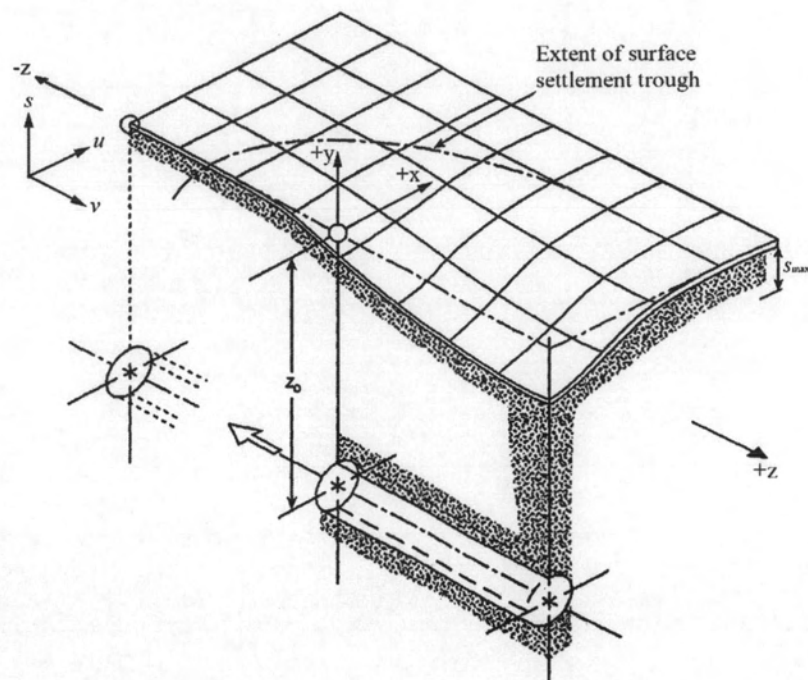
Settlement trough above an advancing tunnel (Attewell et al., 1986)
